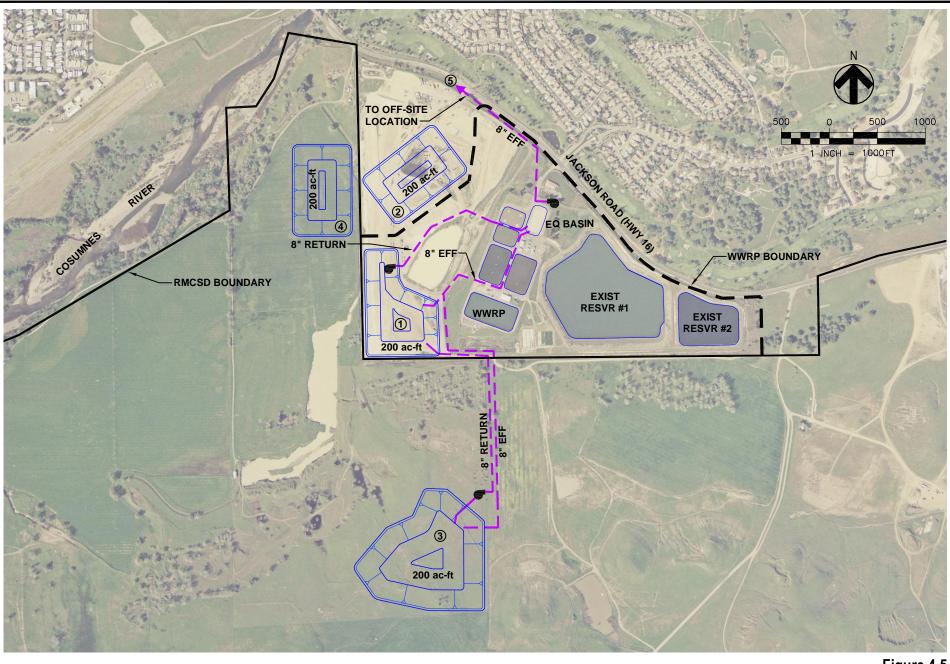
Wastewater Facilities Expansion and Financing Plan SEASONAL STORAGE SITE ALTERNATIVES
